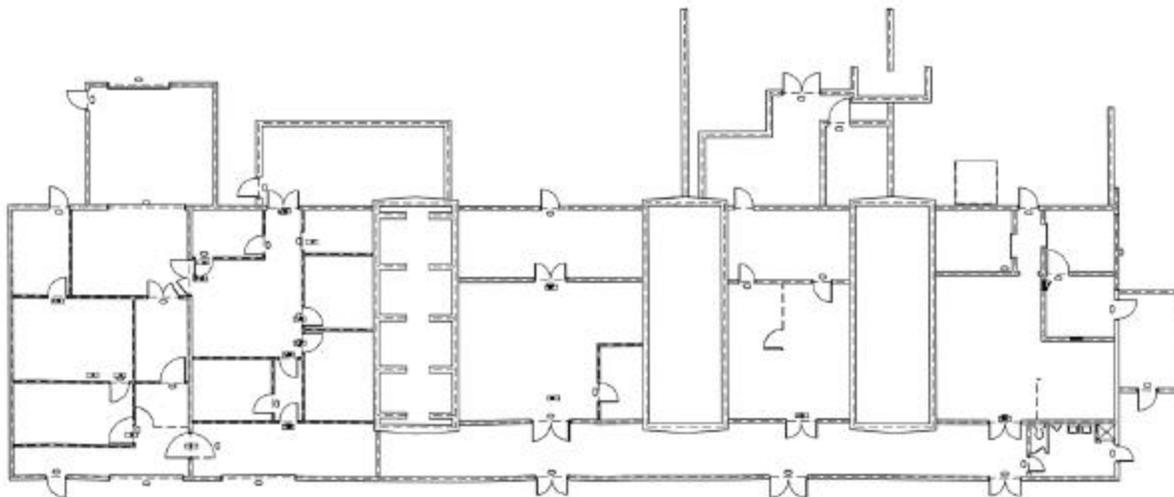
1997 floor plan of Building 907. Modifications are apparent when this figure is compared to Figure 4.
